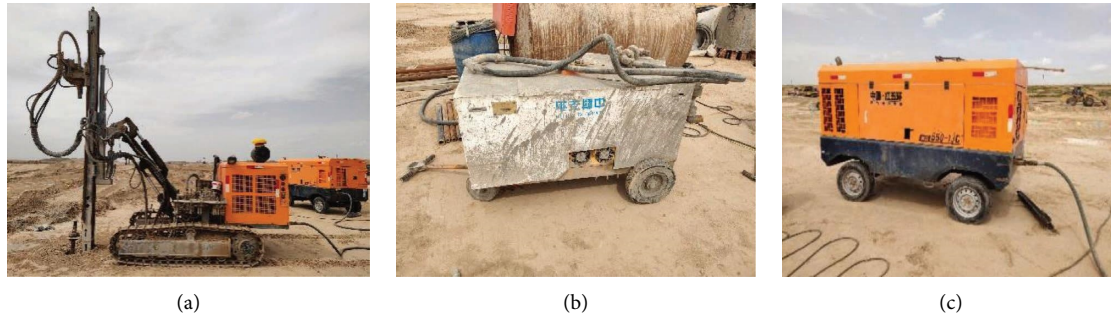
Grouting equipment: (a) drilling machine; (b) grouting pump; (c) air compressor.
